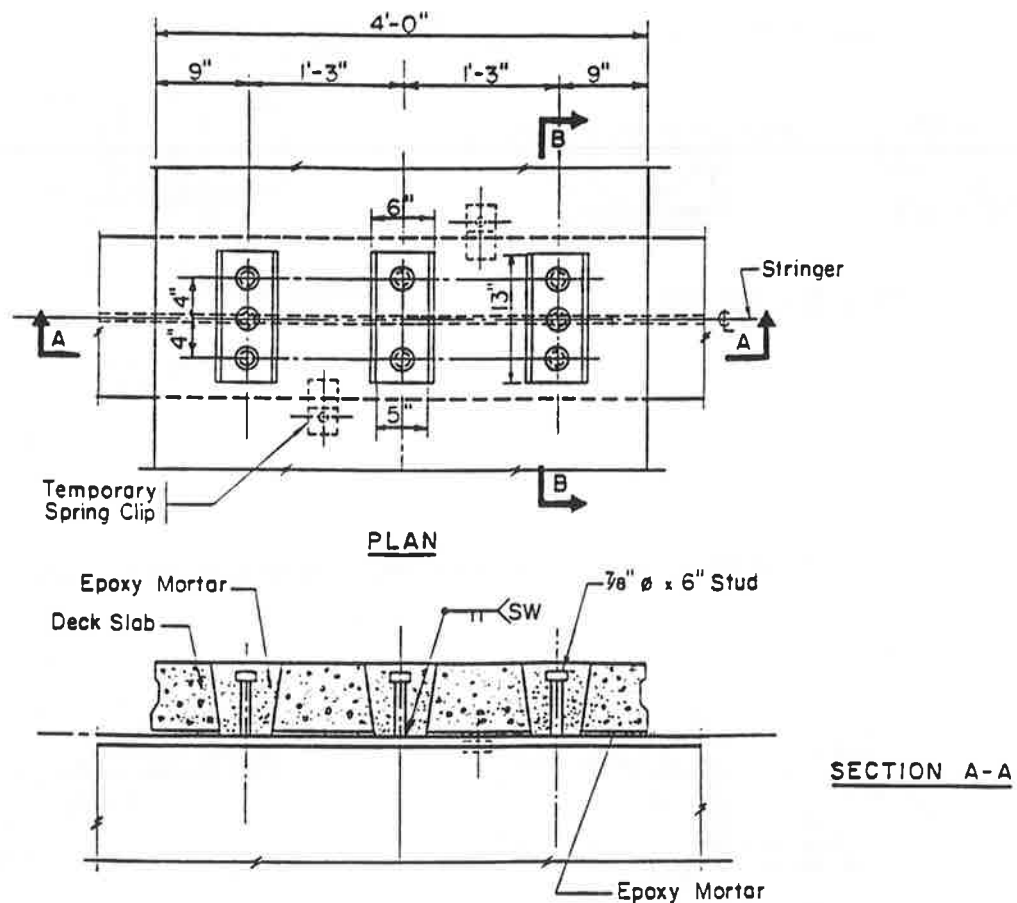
Plan and Section of Welded Stud Connection
